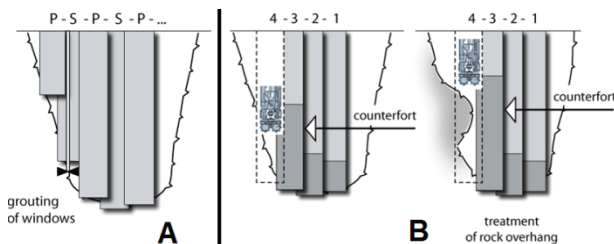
Left original proposal for the project, cut-off wall combined with cement grouting; right the BAUER's proposal using cut-off wall fully embedded in rock
